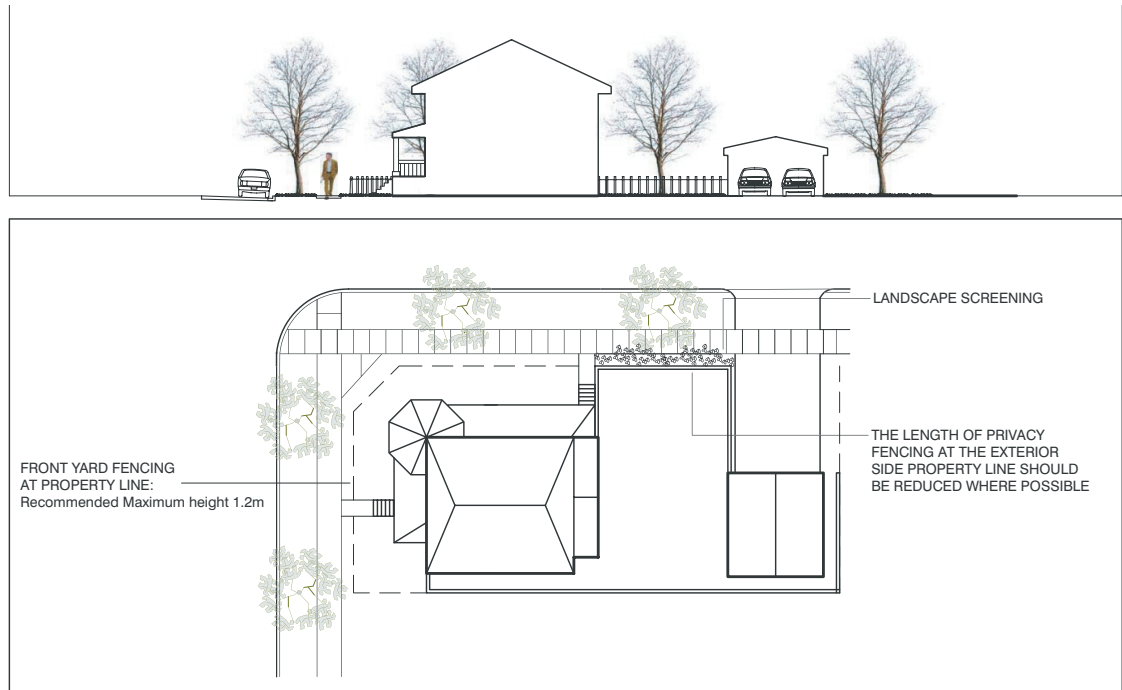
Plan and section view of preferred height and placement of fencing.
